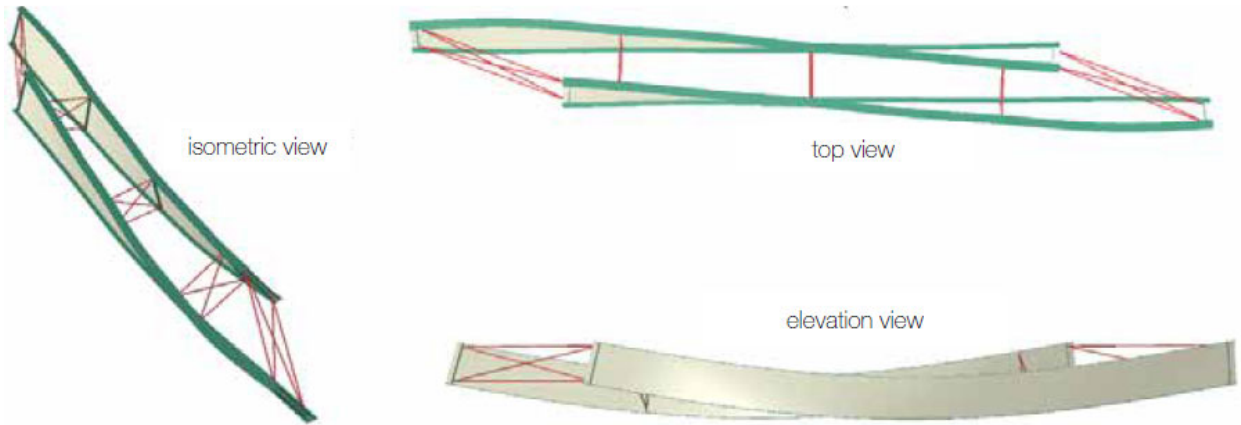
Girder deflections and twist for two simple-span I-girders on parallel skewed supports, subjected to steel dead load, after connecting the cross-frames (NSBA, 2016).
